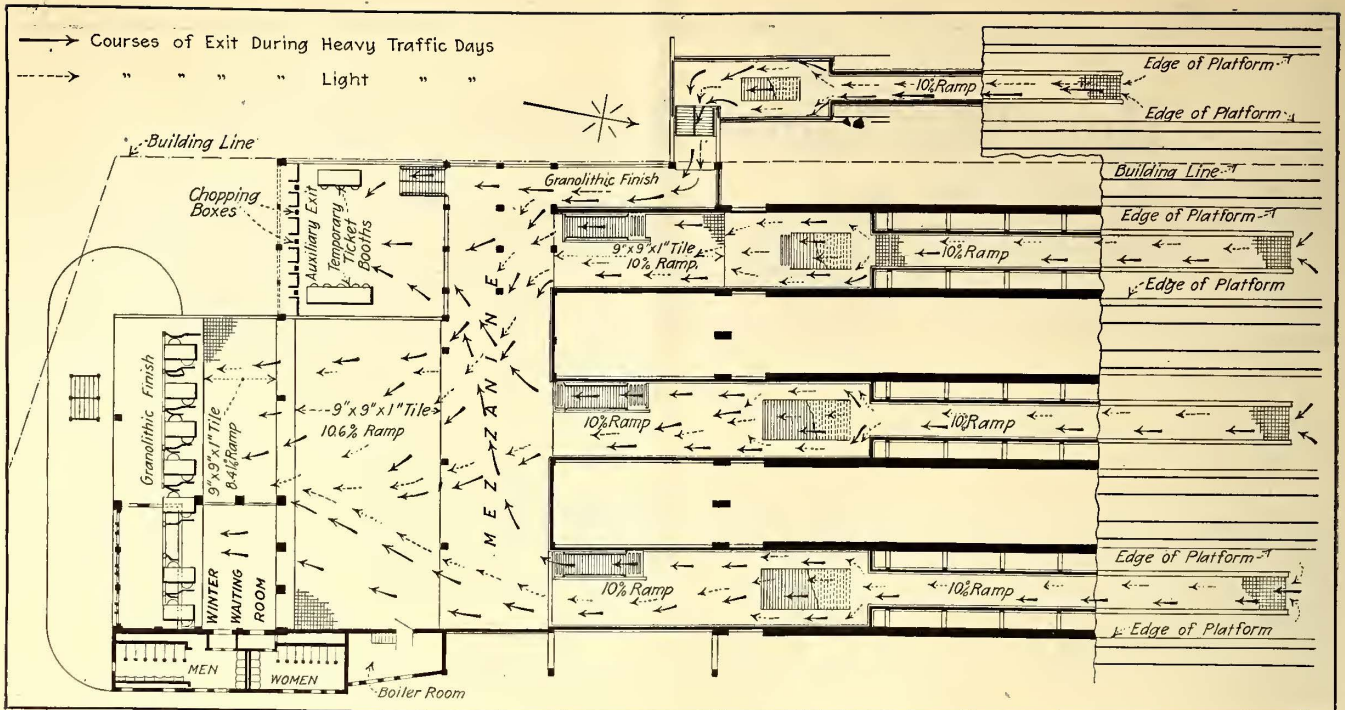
STILLWELL AVENUE STATION PLAN AND FACILITIES FOR CONTROLLING THE CROWDS—ARROWS INDICATE LIGHT AND HEAVY TRAFFIC EXIT PATHS
